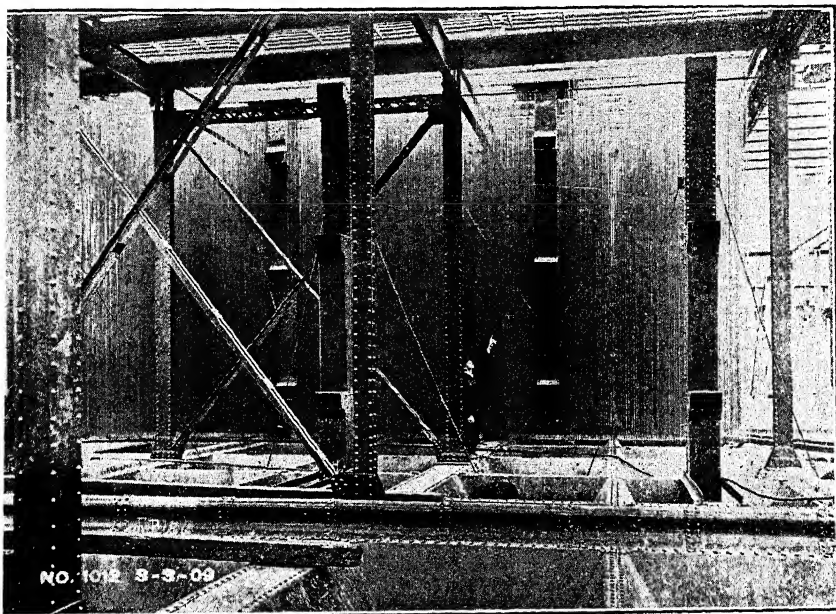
PLATE XXVII.—INTERIOR OF DUST CHAMBER, SHOWING WIRES AND COLD-AIR PIPES.
